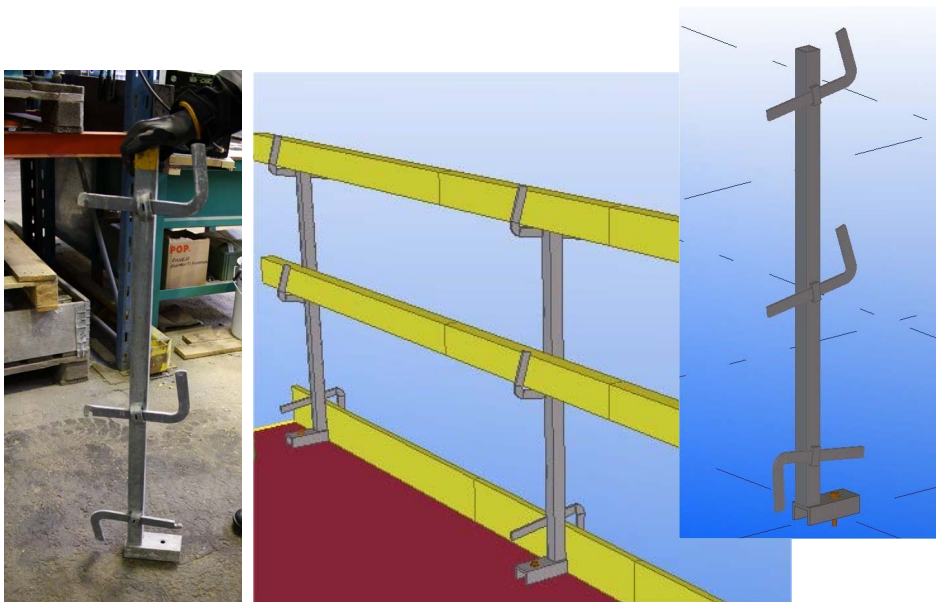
Safety railing equipment modelled for the first pilot project (guardrail post for surface installation used together with timber railings).
